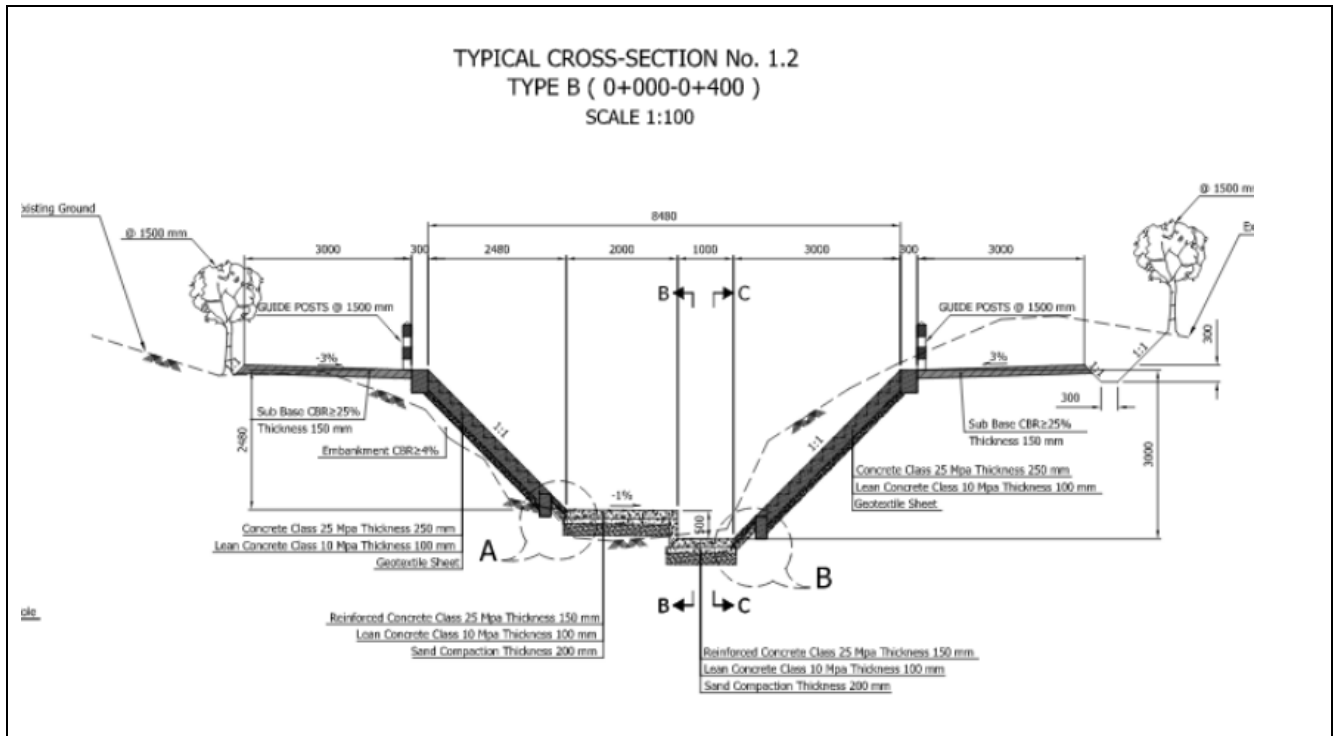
Typical cross-section No. 2.2 of Huoay Long Kong, Type B
